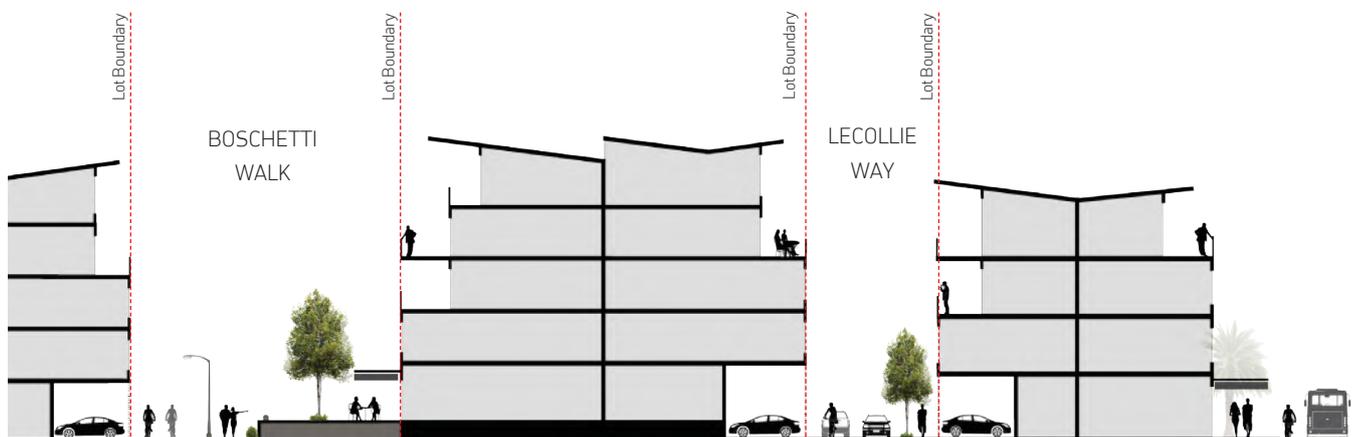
Section 1 - Changes in building height for development fronting the railway platform
